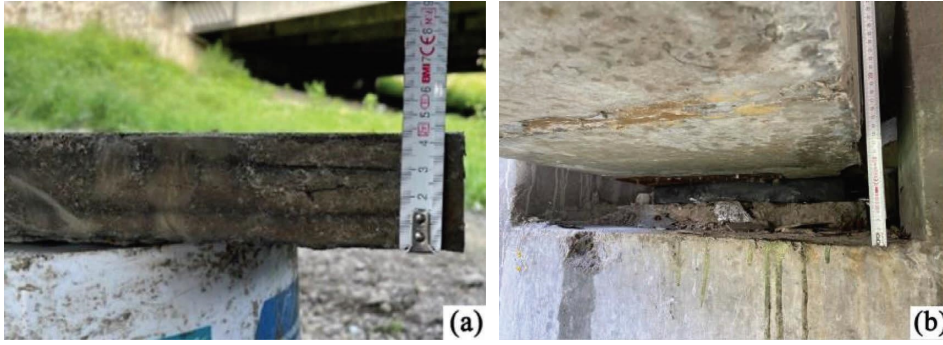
Bearing damage: (a) bearing aging cracking and unable to free deformation and (b) space for bearing work.
